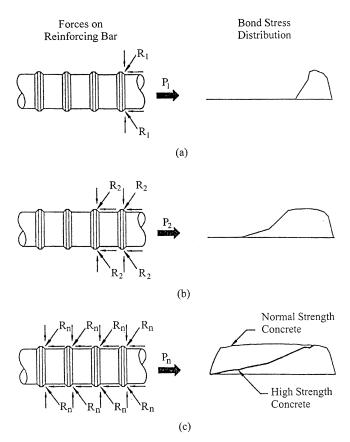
Freebody diagram of reinforcing bar embedded in concrete and subjected to tension.
